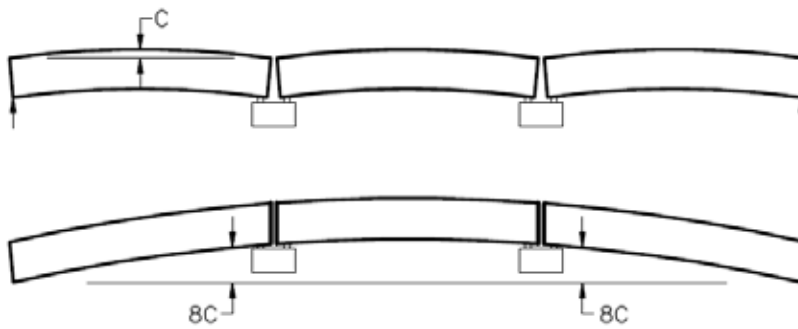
Pier elevation adjustment for a three-span bridge.
